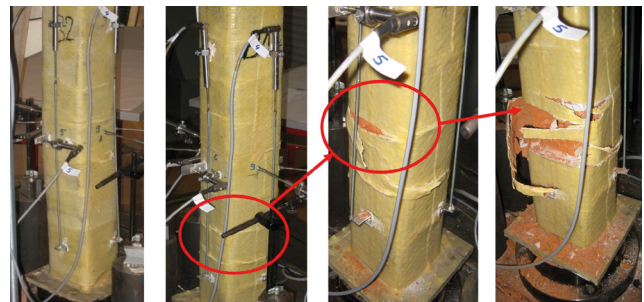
Development of specimen damaging during testing until failure (B2 specimen)
